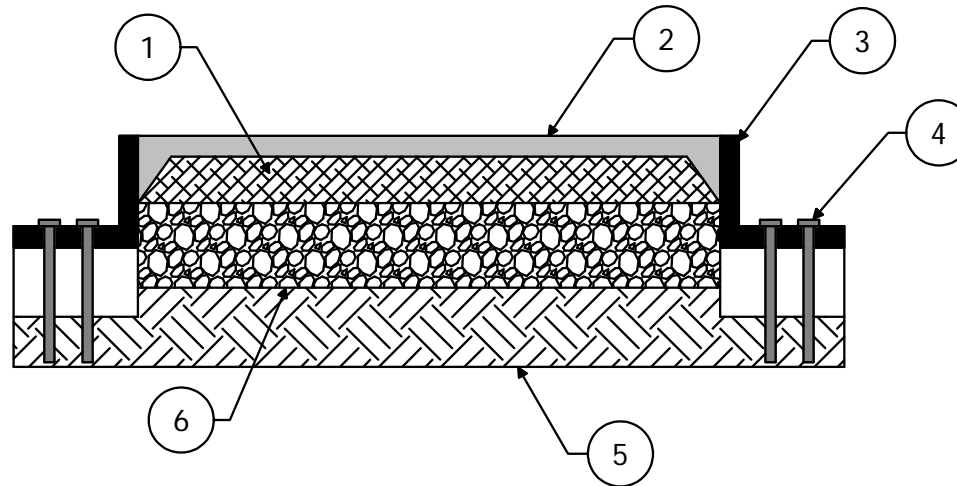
TOTWALK SURFACING WITH MANUFACTURED EDGING
